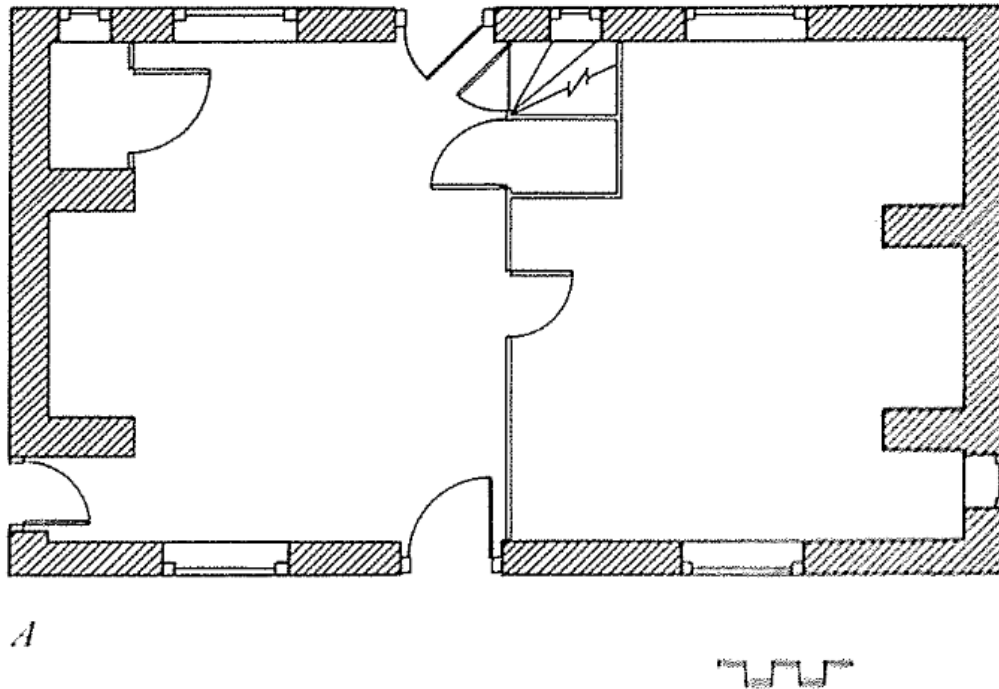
Ashton House plan, c. 1705 in New Castle County, Delaware. (Source Lanier and Herman, 1997)
